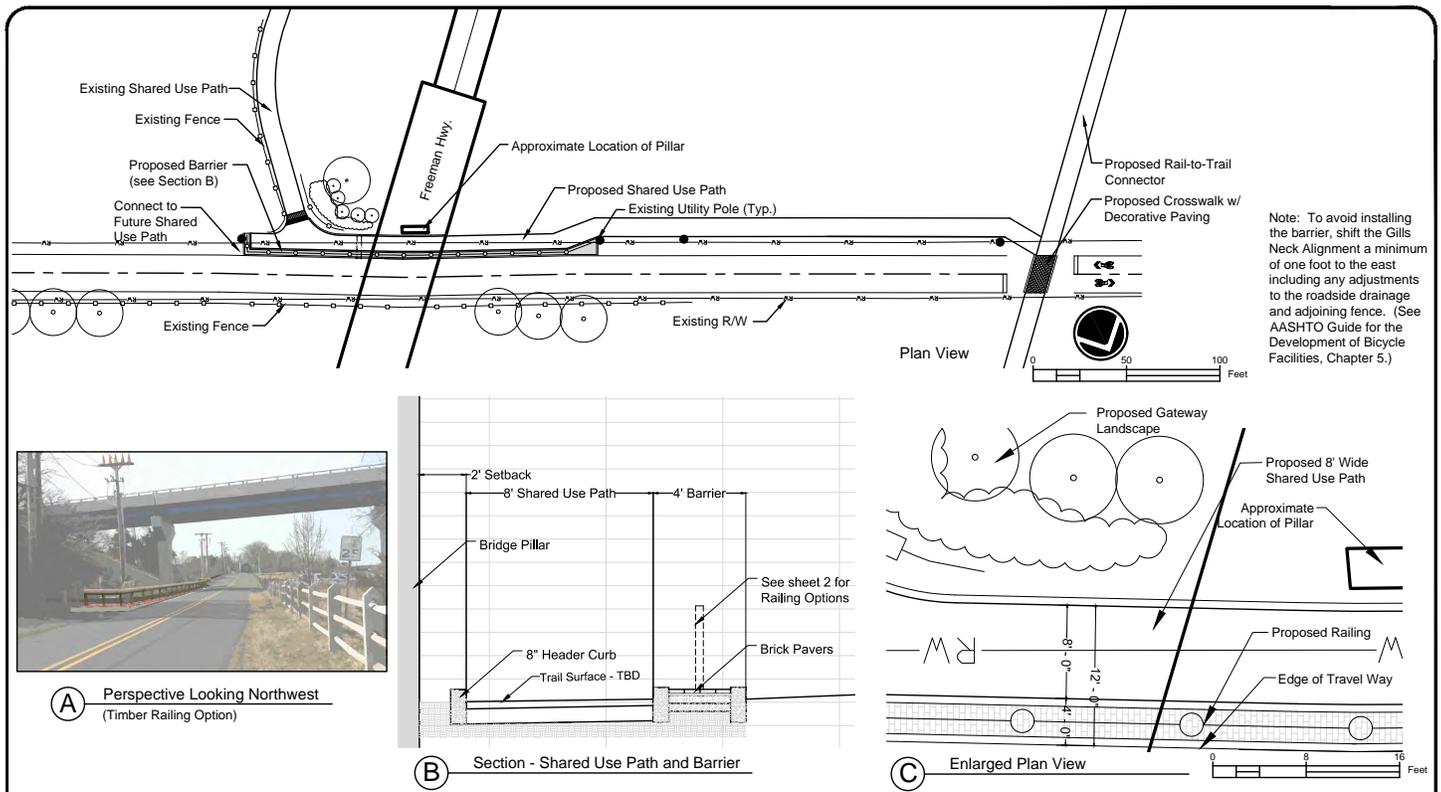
Conceptual drawing showing long-term plan of area as well perspective and section of timber railing options.
